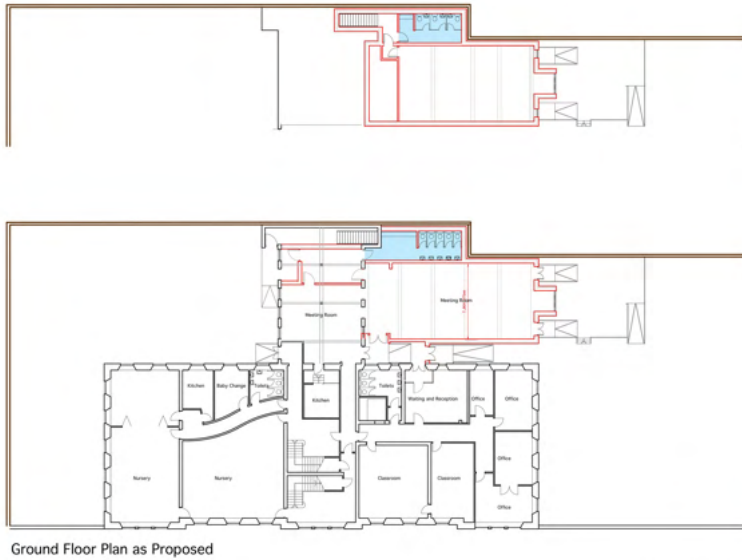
Ground Floor Plan as Proposed. Assessment relevance: Proposed rear extension footprint, amended internal layout and proposed meeting room accommodation. Source: Padrino Design drawing pack, job no. 2499, 311 Calder Street, Glasgow G42 7NQ.
